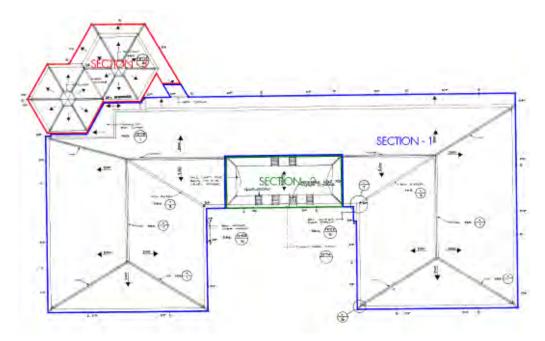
Spinal Injuries Unit – Architectural Roof Plan
